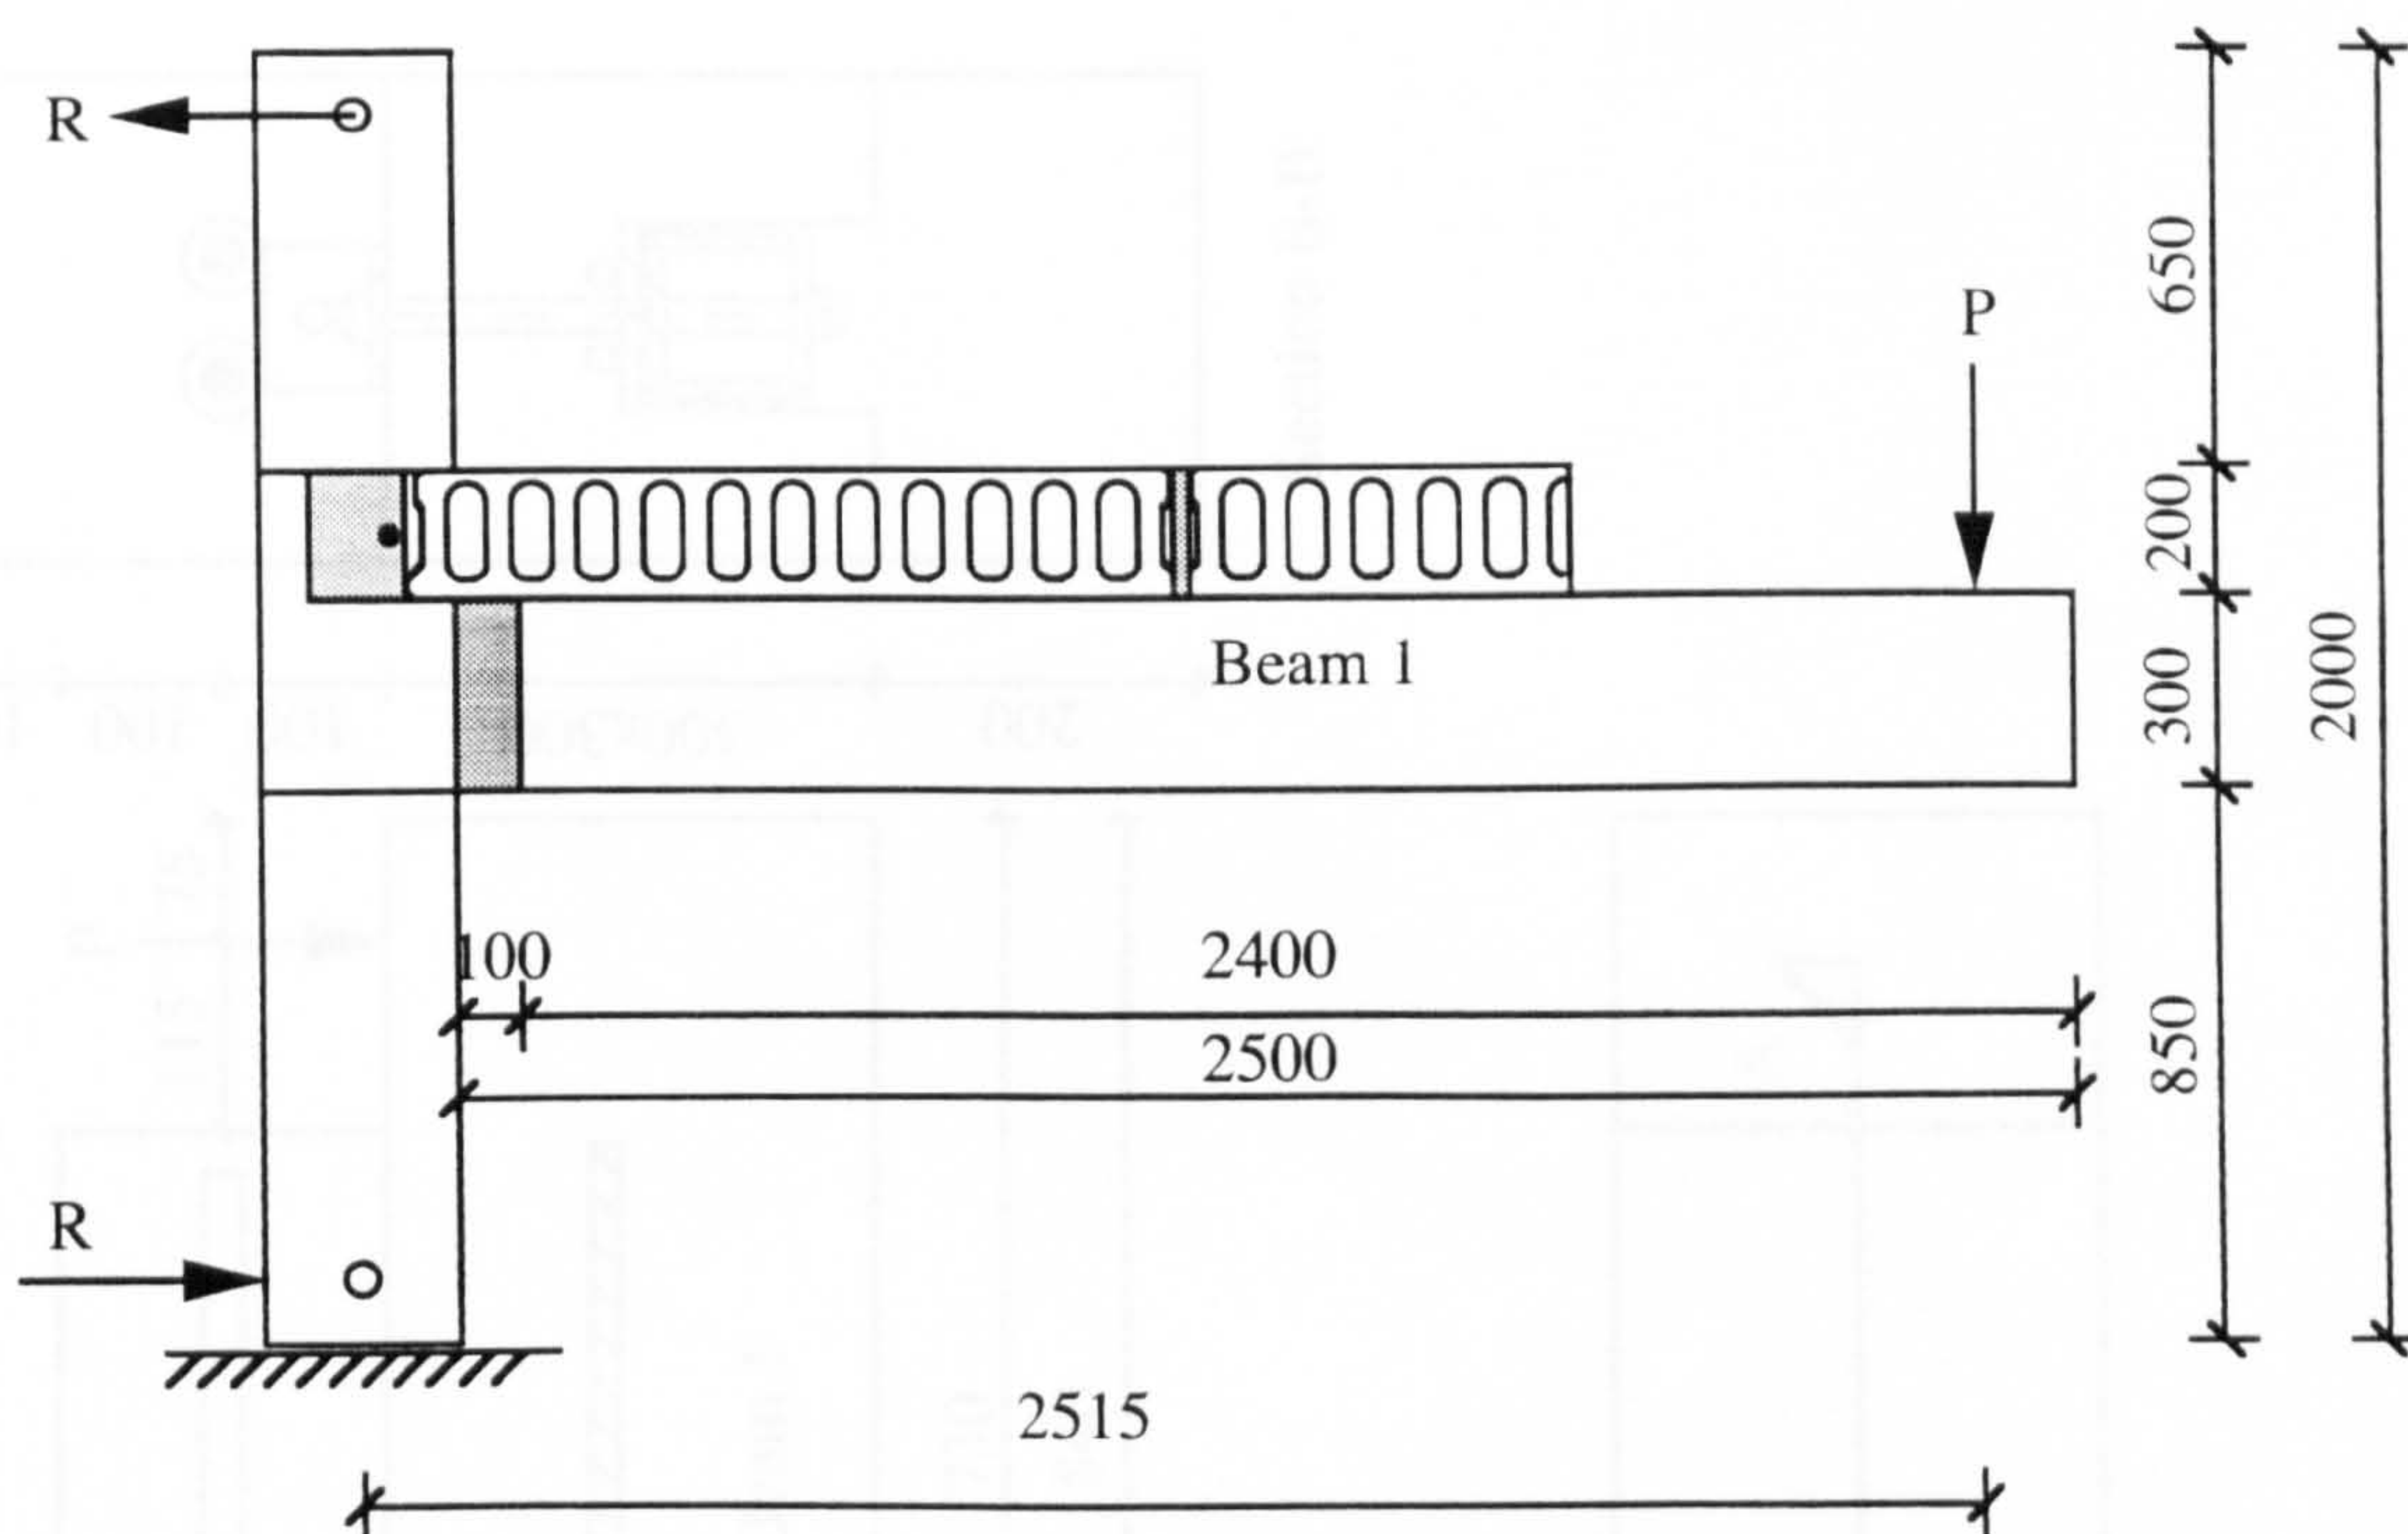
(a): Front elevation of subframe SF2 with floor slabs
